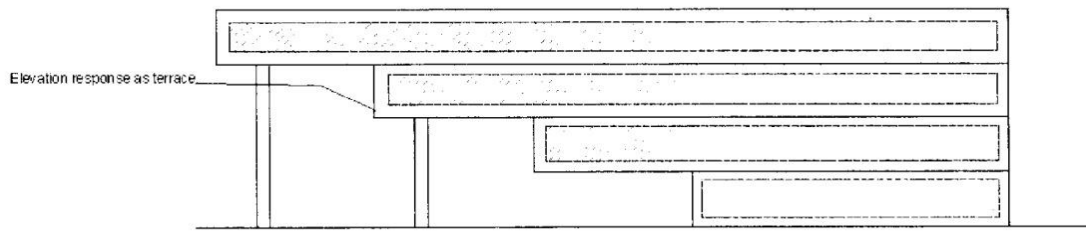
Terraces can act as an elevation response further providing natural shade.
